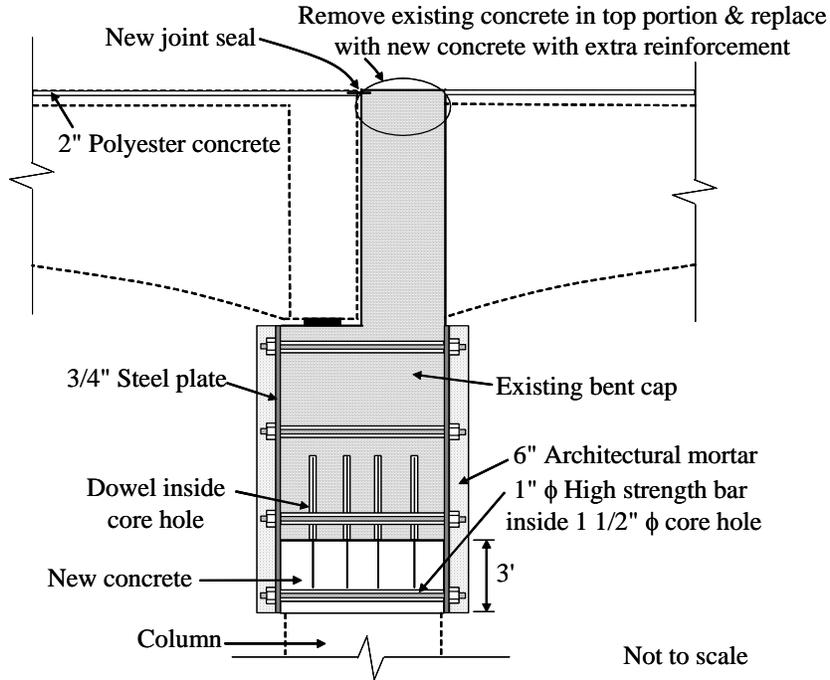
Bent Cap Retrofit at Expansion Joints (one simply supported span)
